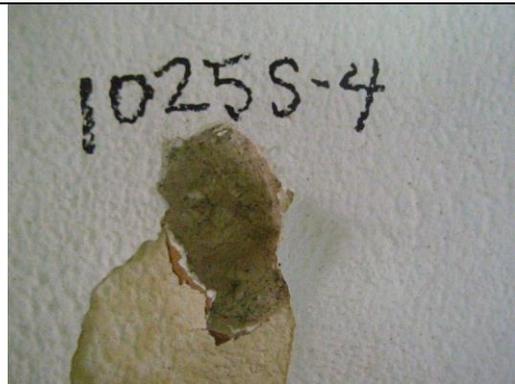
Plaster (1025S-4) Dining Room, Wall B. Trace <1% Chrysotile Asbestos Detected (PC=0.50%).
